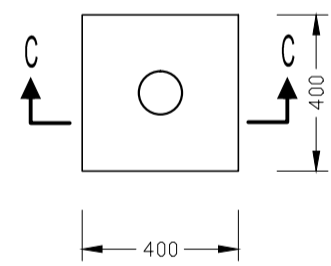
F: PLAN FOR FOOTING TOTEM/CANTILEVER POLE
